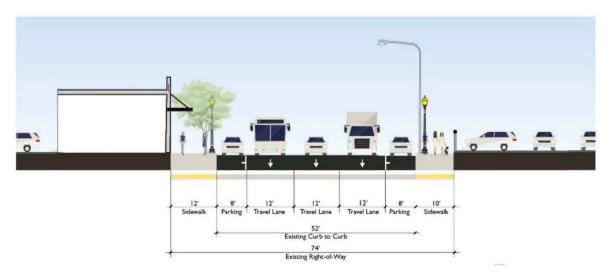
Existing Conditions Cross-section - Hedges Avenue to SR180 - Blackstone Avenue (facing North)
